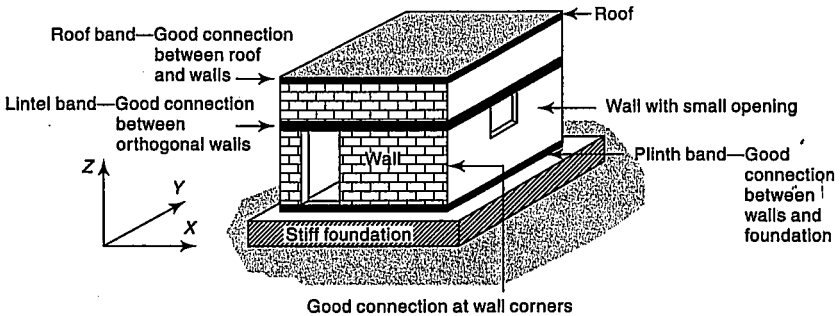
Principal directions of a building and essential requirements to ensure box action in a masonry building (Murthy 2005)
